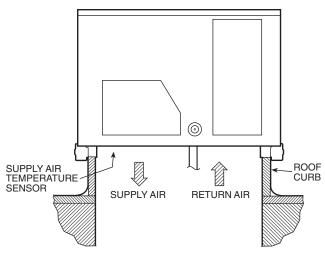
Typical Mounting Location for Supply Air Temperature (SAT) Sensor on Small Rooftop Units
